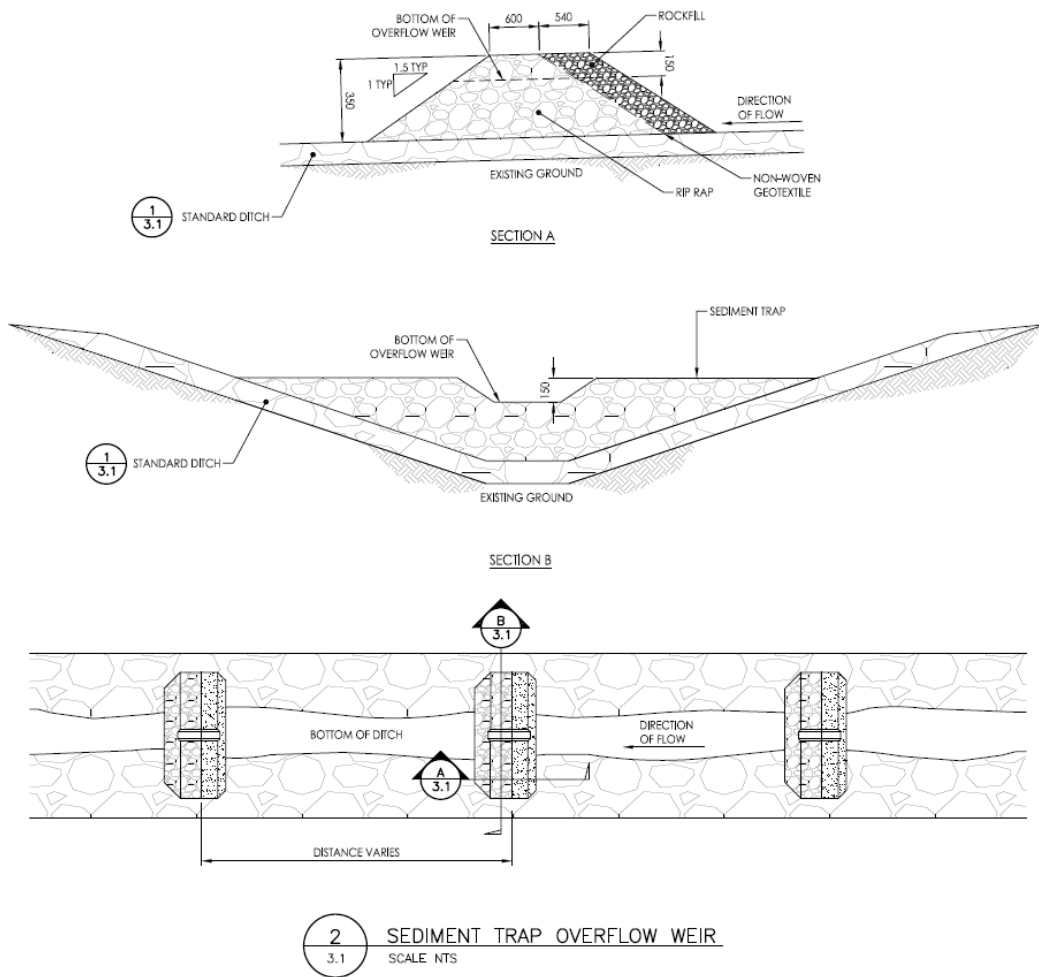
Sediment Trap Overflow Weir Typical Detail
